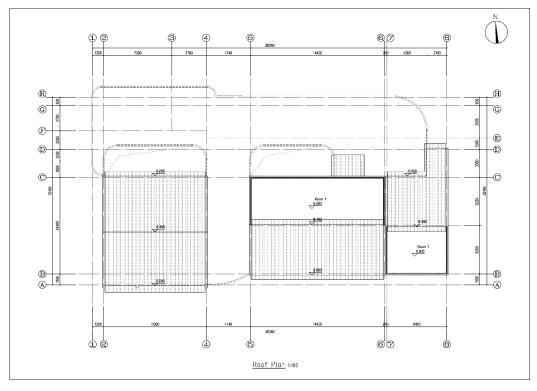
The Roof Plan of Building Complex (Drawn by the author)
